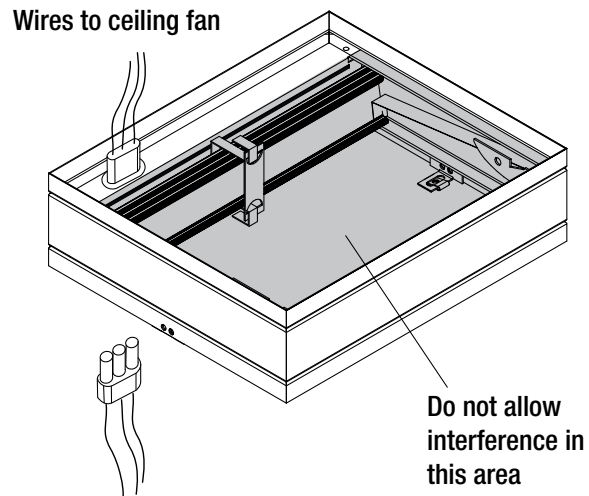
Isometric view for wiring the CRD-3XX series damper to the lighted grille and ceiling fan.
